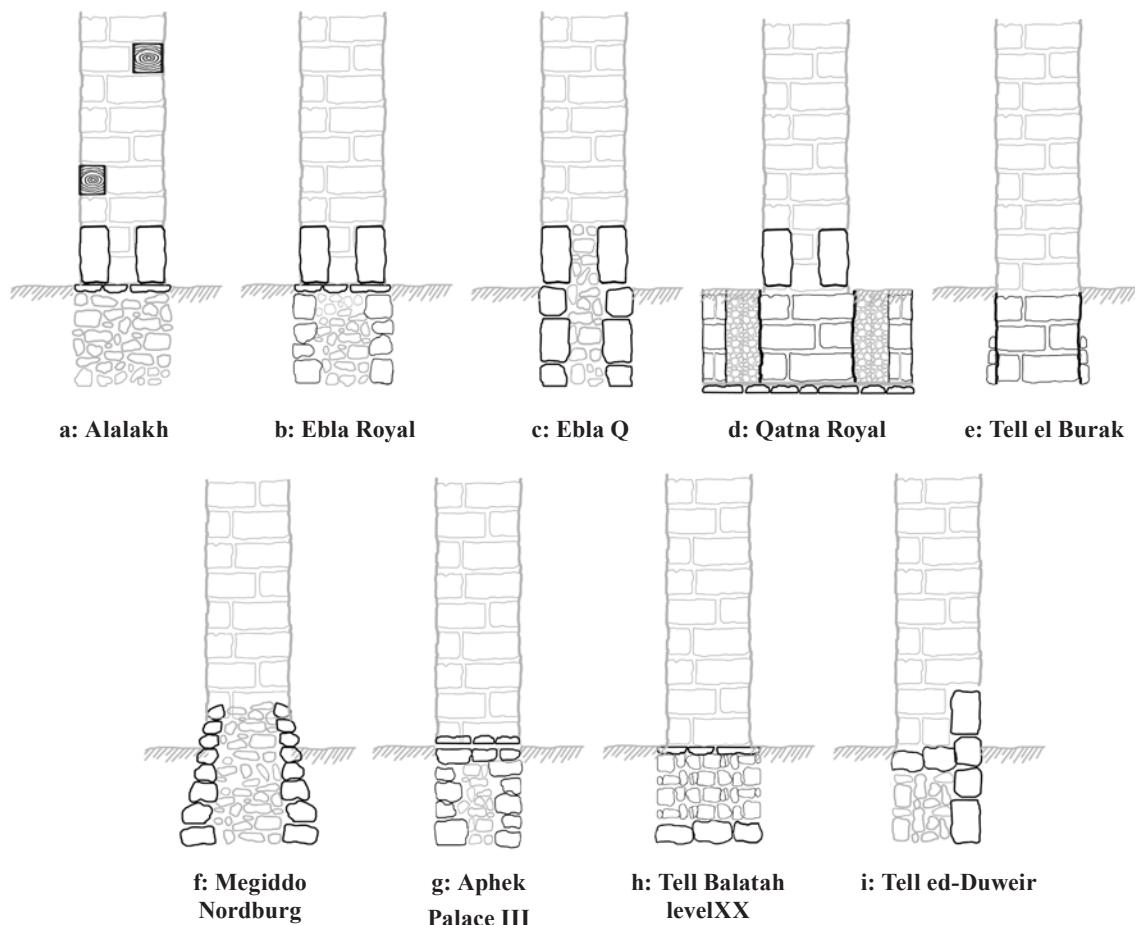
Drawings of the cross-sections of walls/foundations of some of the studied structures. In each case, the distinctive elements are marked with darker lines
